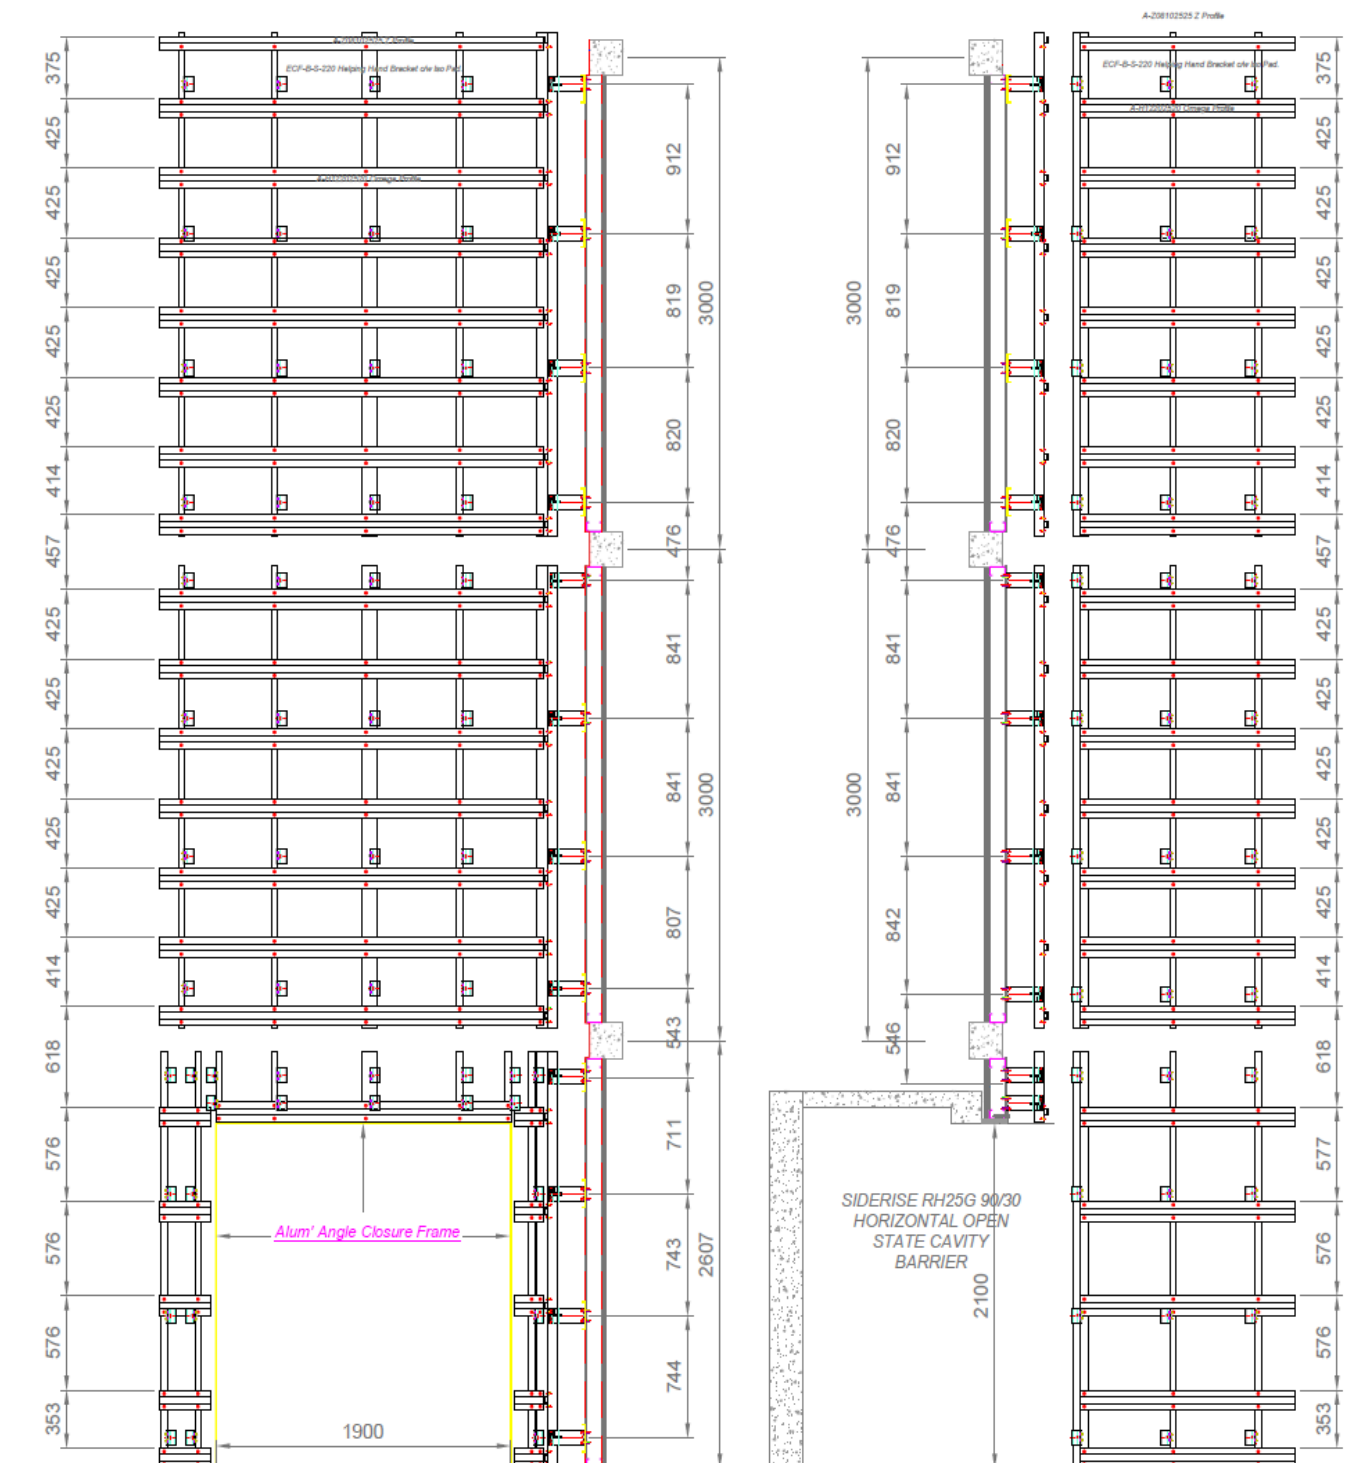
Sketch of the tested facade. Elevation layout of SFS sections.
